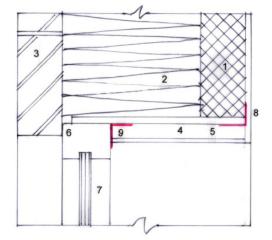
External wall construction. Drawing by Lacey Interior Architecture Ltd.
